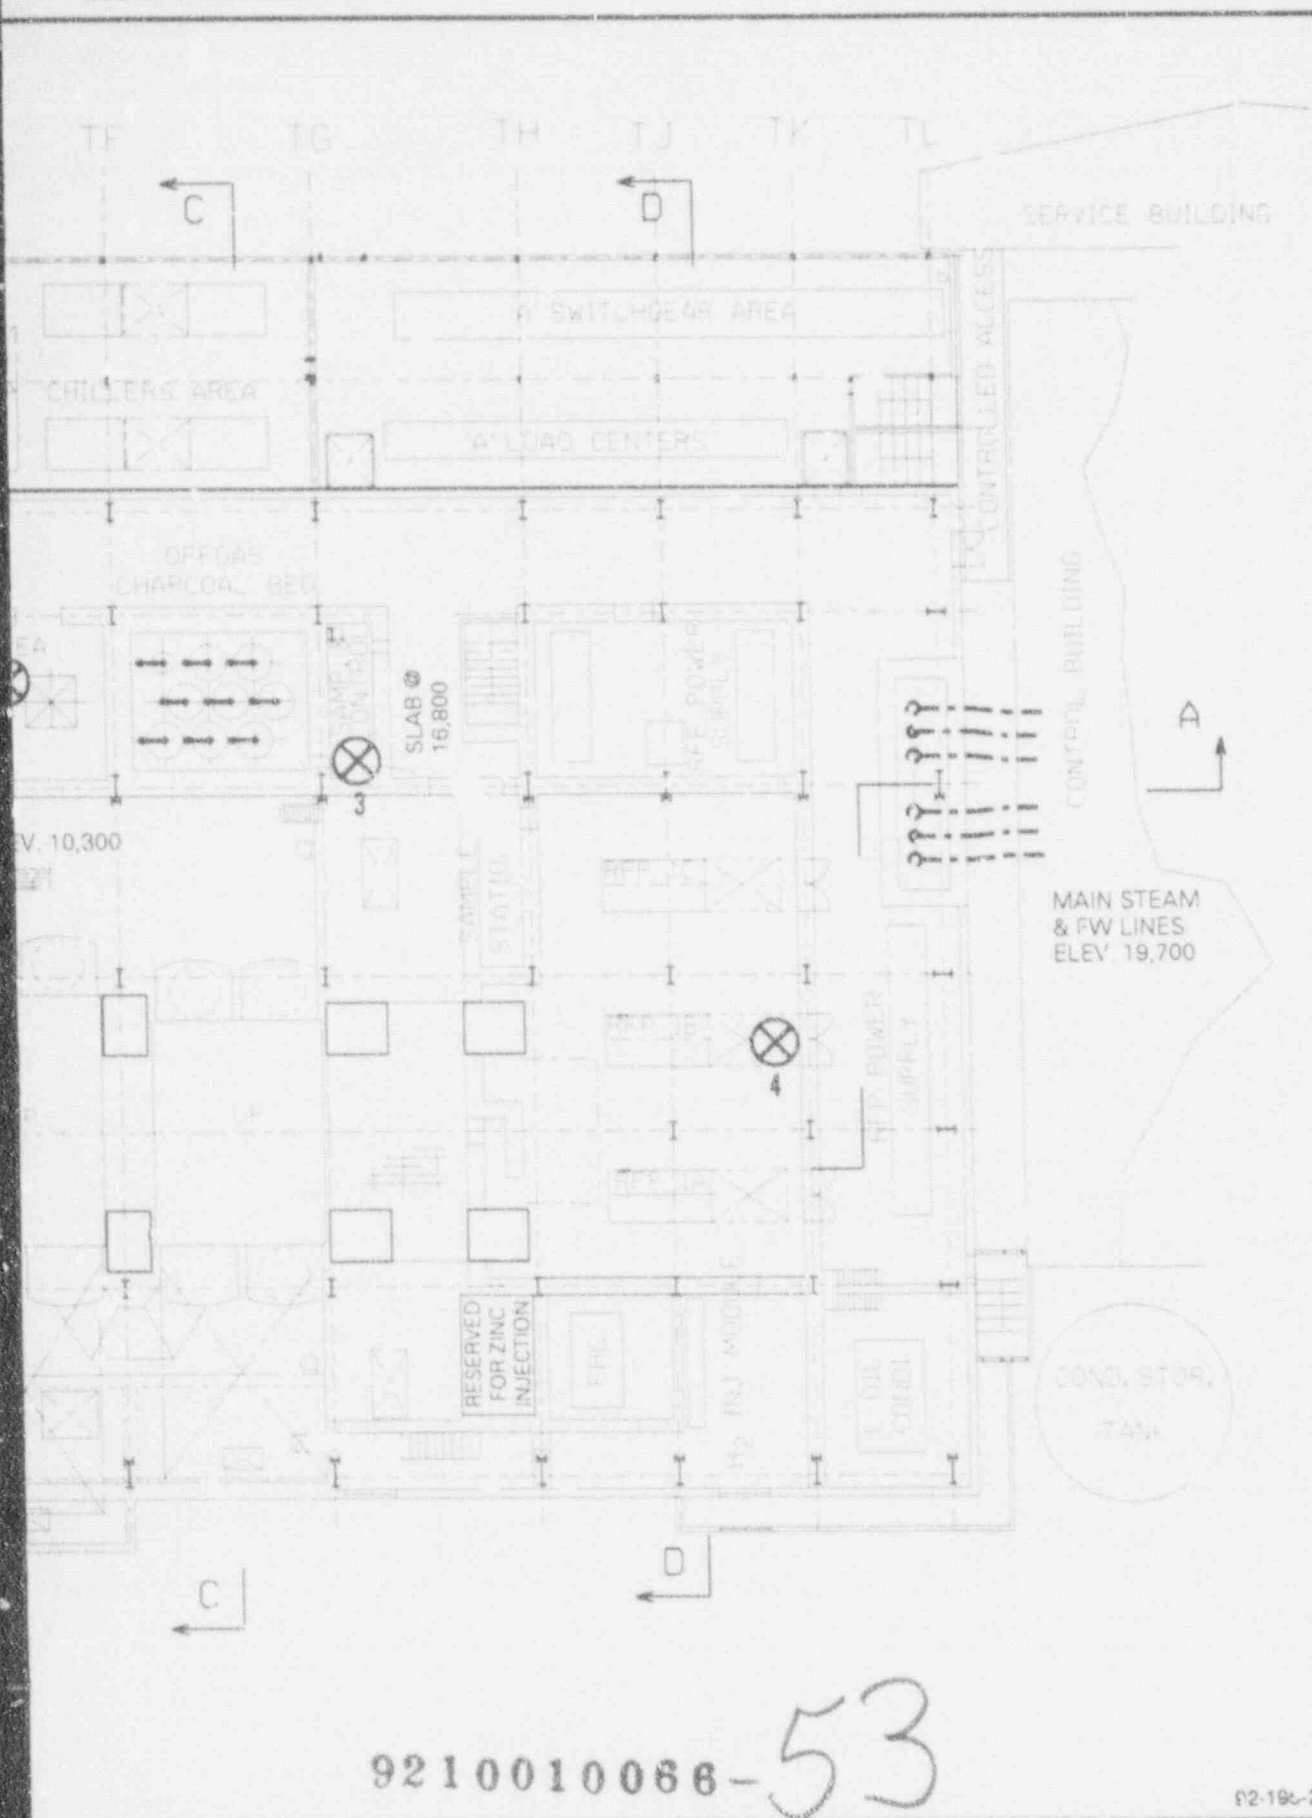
A.4-21 TURBINE BUILDING FIRE PROTECTION AT ELEVATION 30300mm
